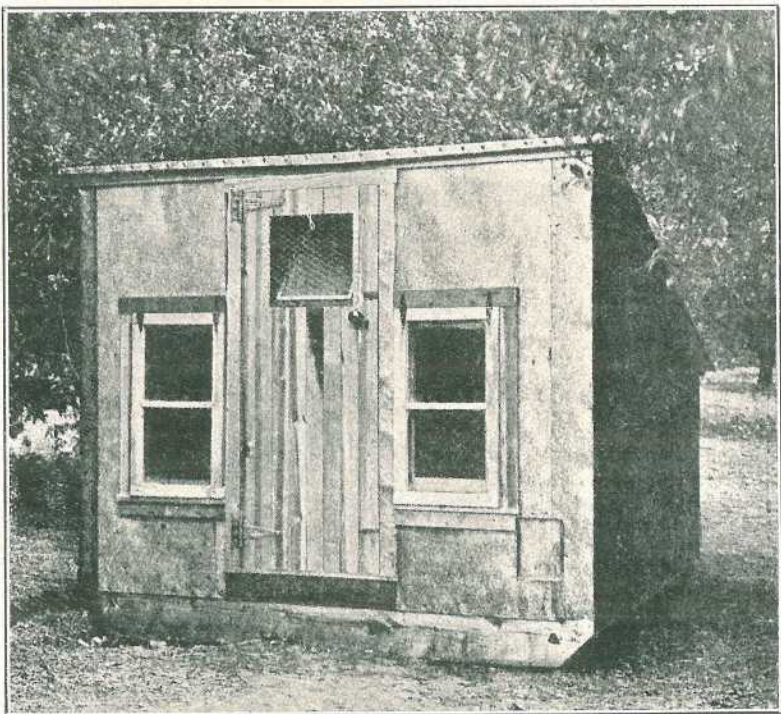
Shed-roof colony house for chicks or mature fowls.
